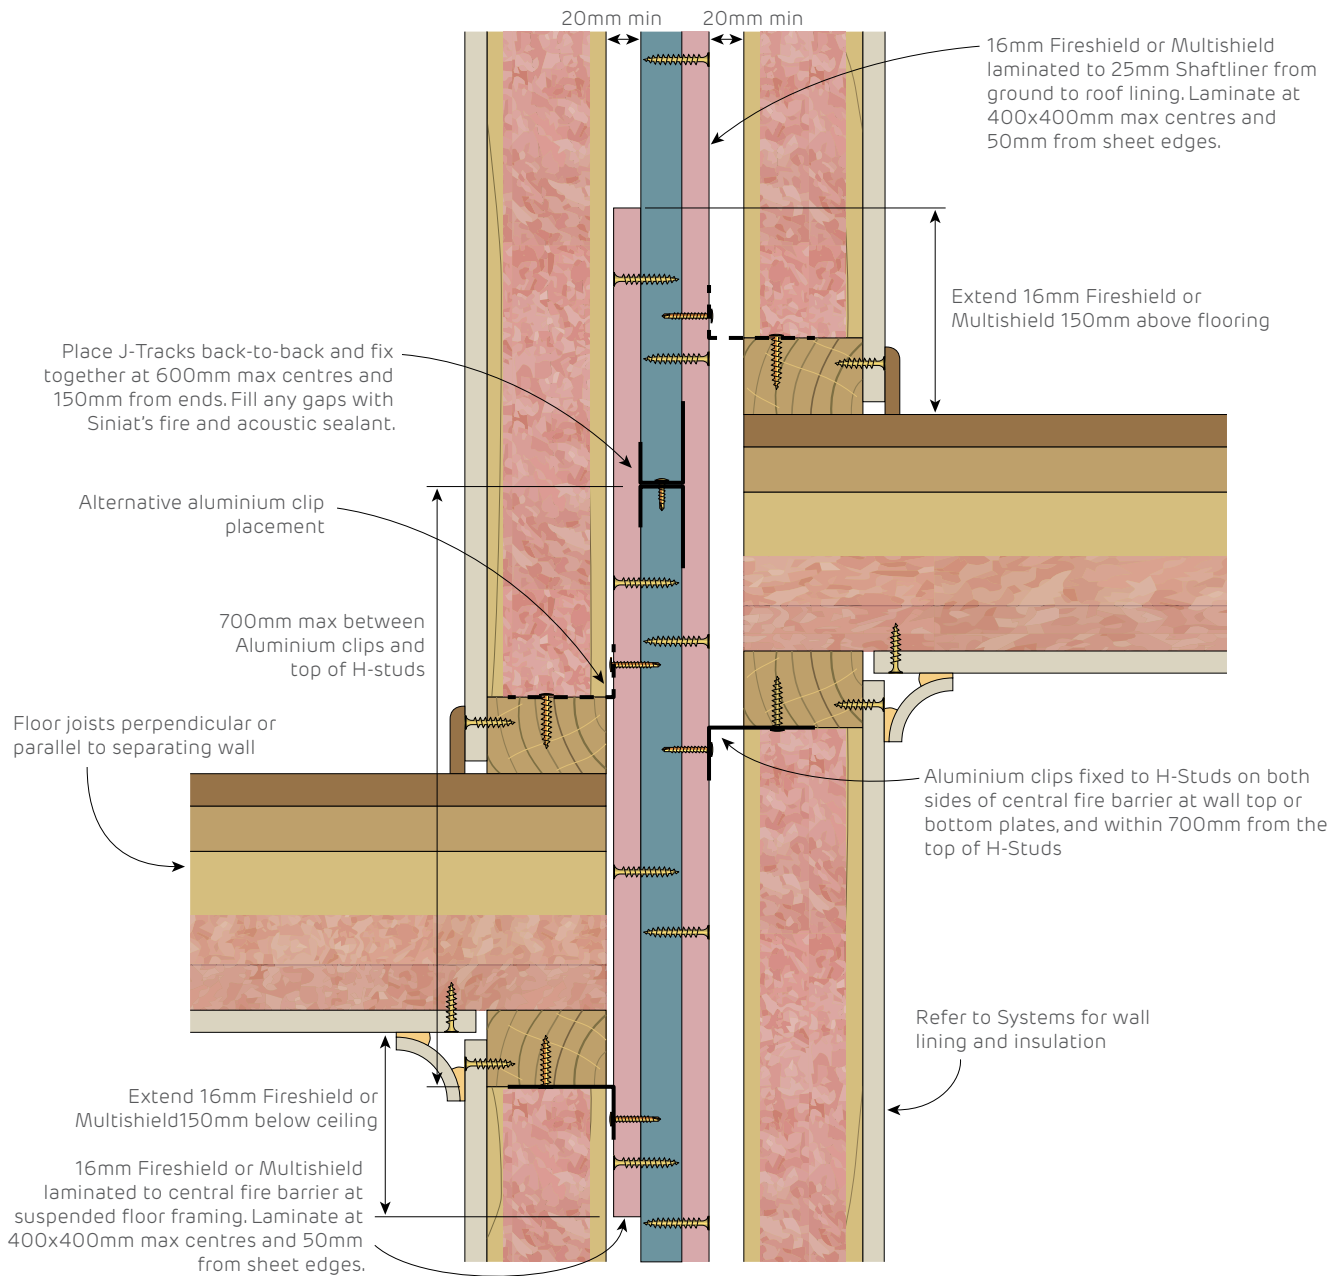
Interhome Wall to Upper Storey Staggered Floor
